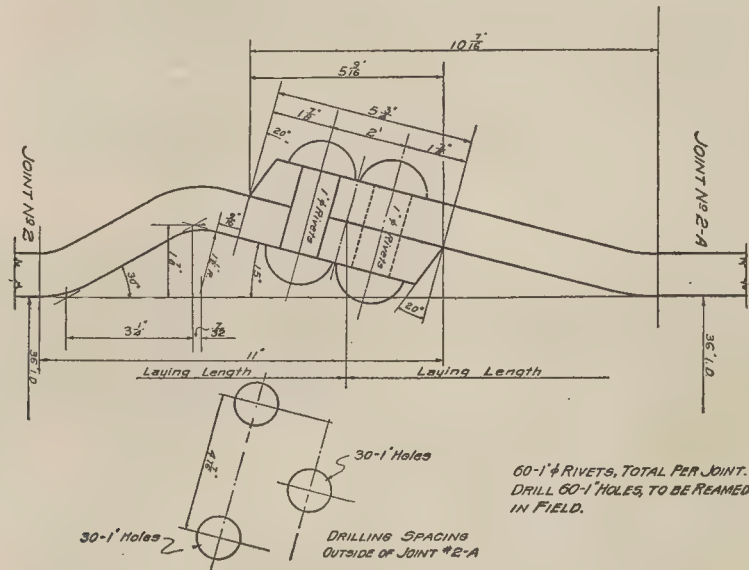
TYPICAL DOUBLE RIVETED BUMP JOINT.
